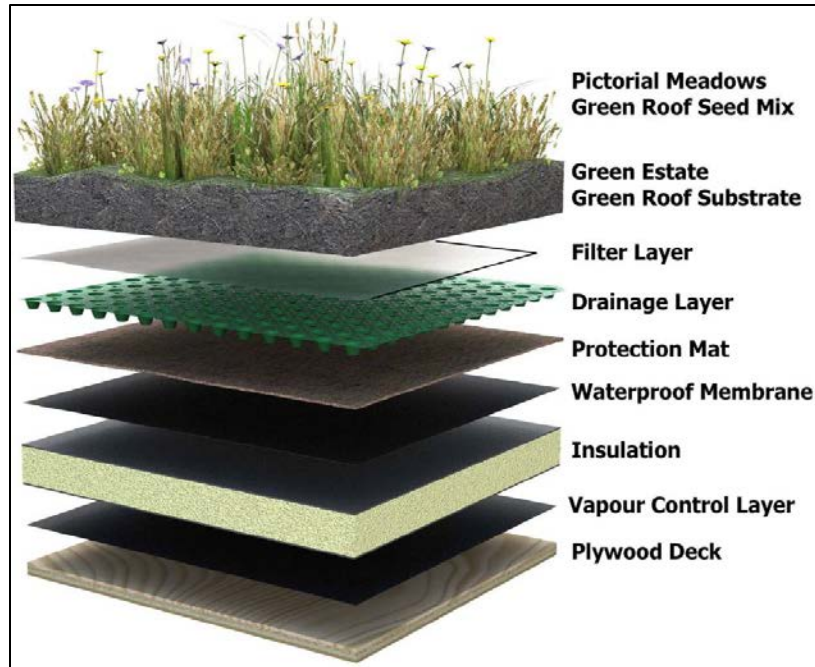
sectional view of a typical green roof system components. Image courtesy of www.impressivemagazine.com
